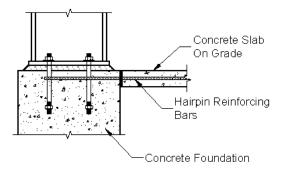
Typical Detail Using Hairpin Bars.
